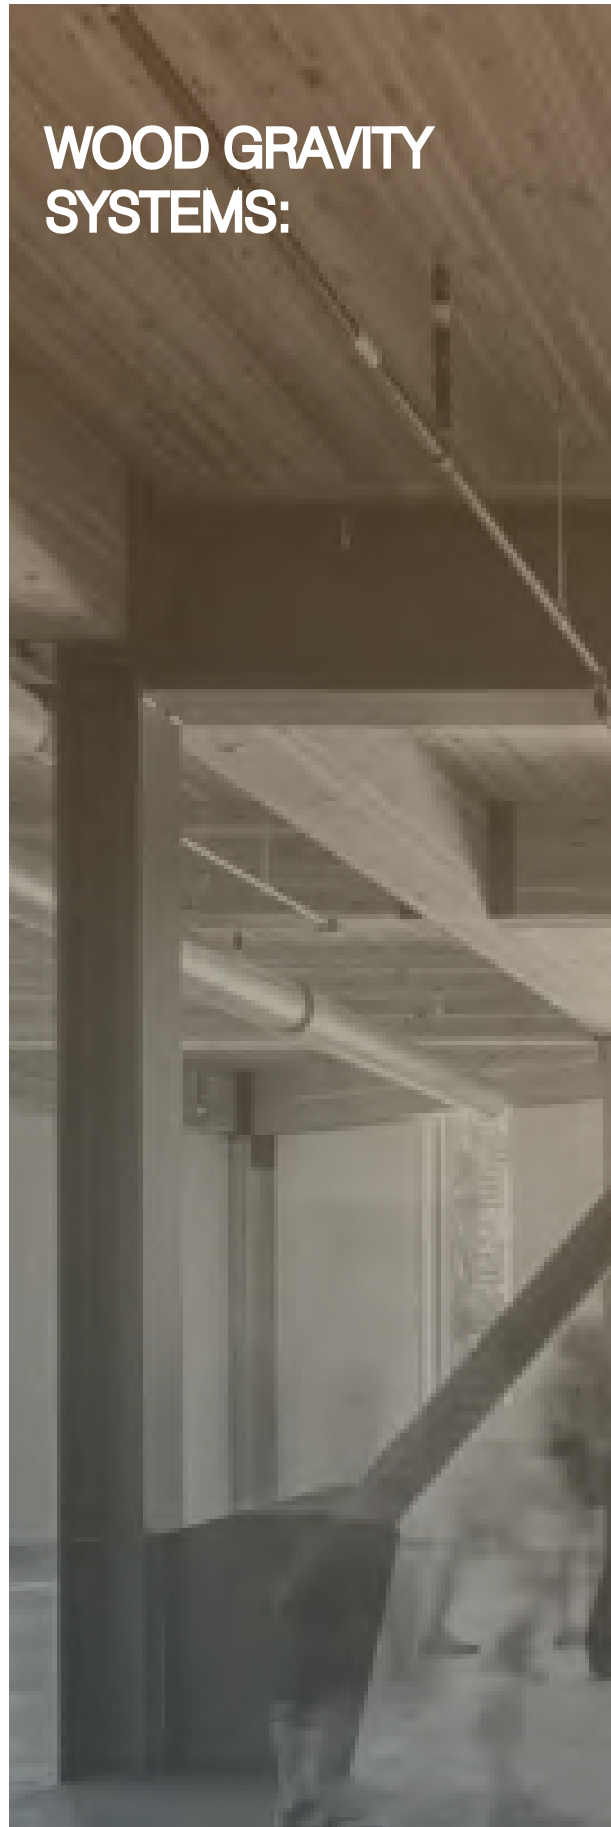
| Wooden Ceiling Screening in Atrium.
